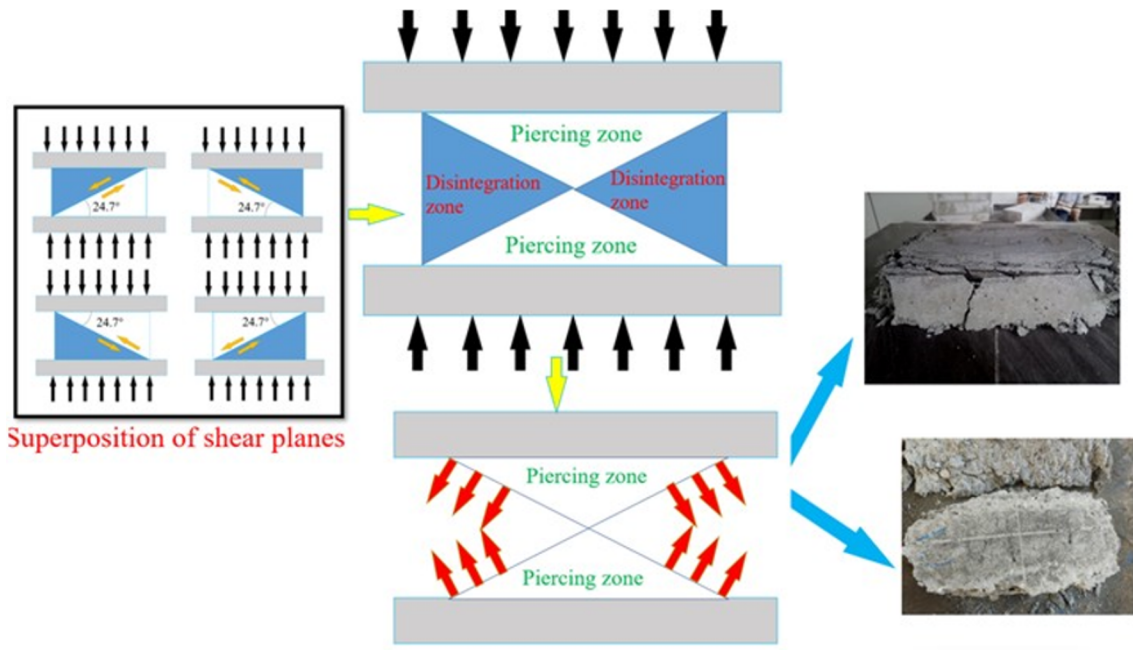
Failure analysis loading surfaces of 240×53 mm and 115×53 mm.
